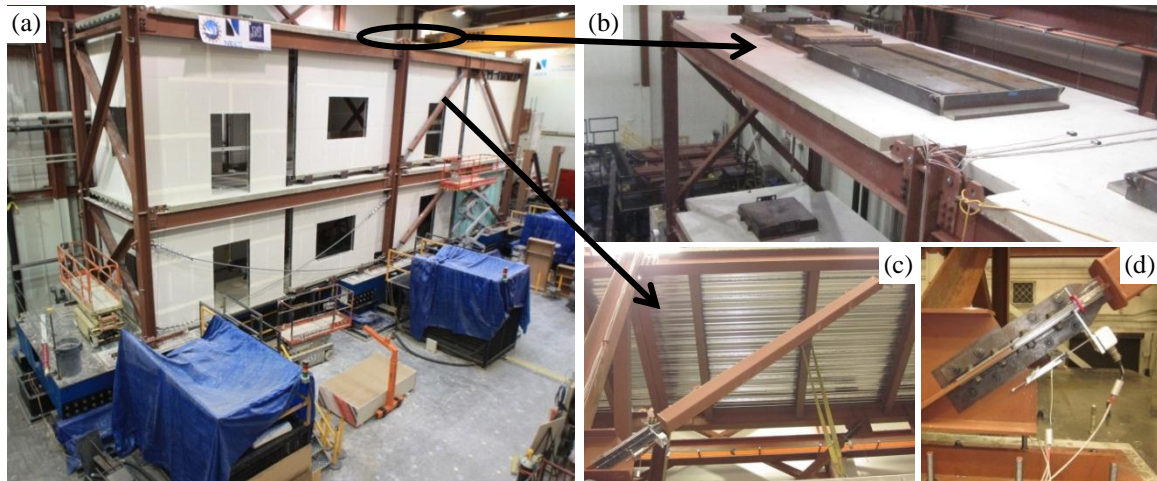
Test-bed Structure Design Variables: (a) 3-D view, (b) additional floor mass, (c) buckling restrained brace (BRB), (d) BRB connection
